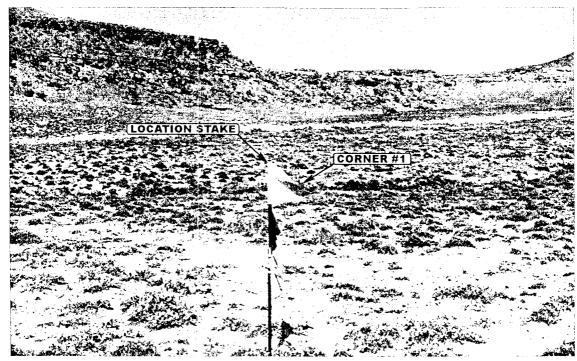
PHOTO: VIEW FROM LOCATION STAKE TO CORNER #1
